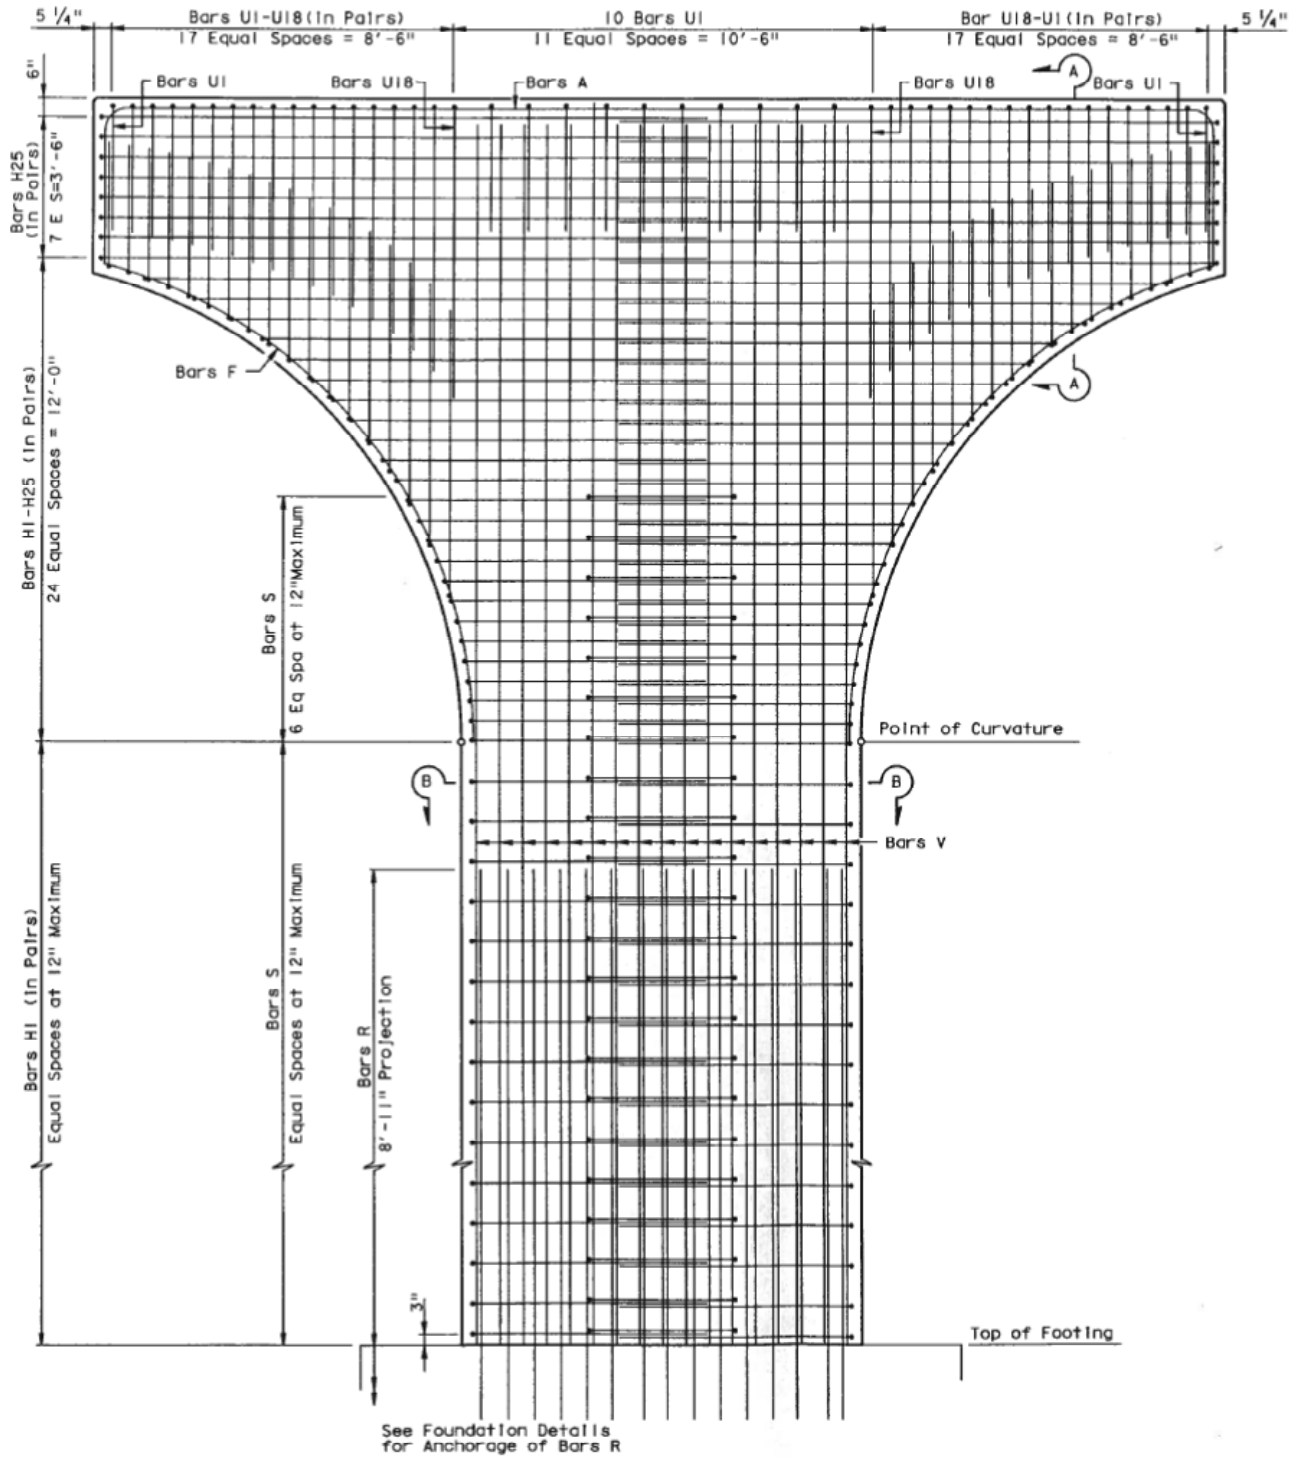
Sample TxDOT Column Reinforcement Detail.
